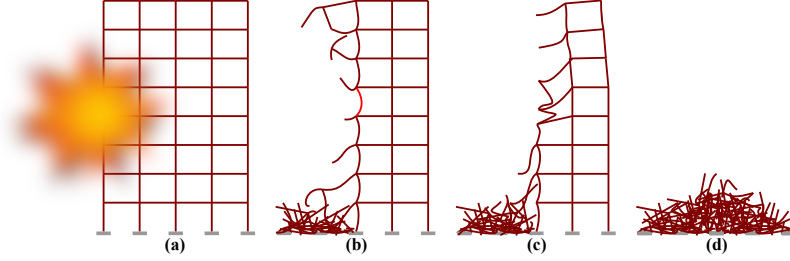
A framed building structure under blast load; (a) blast loading on the structure, (b) direct blast damages, (c) progressive collapse and (d) final collapse state.
